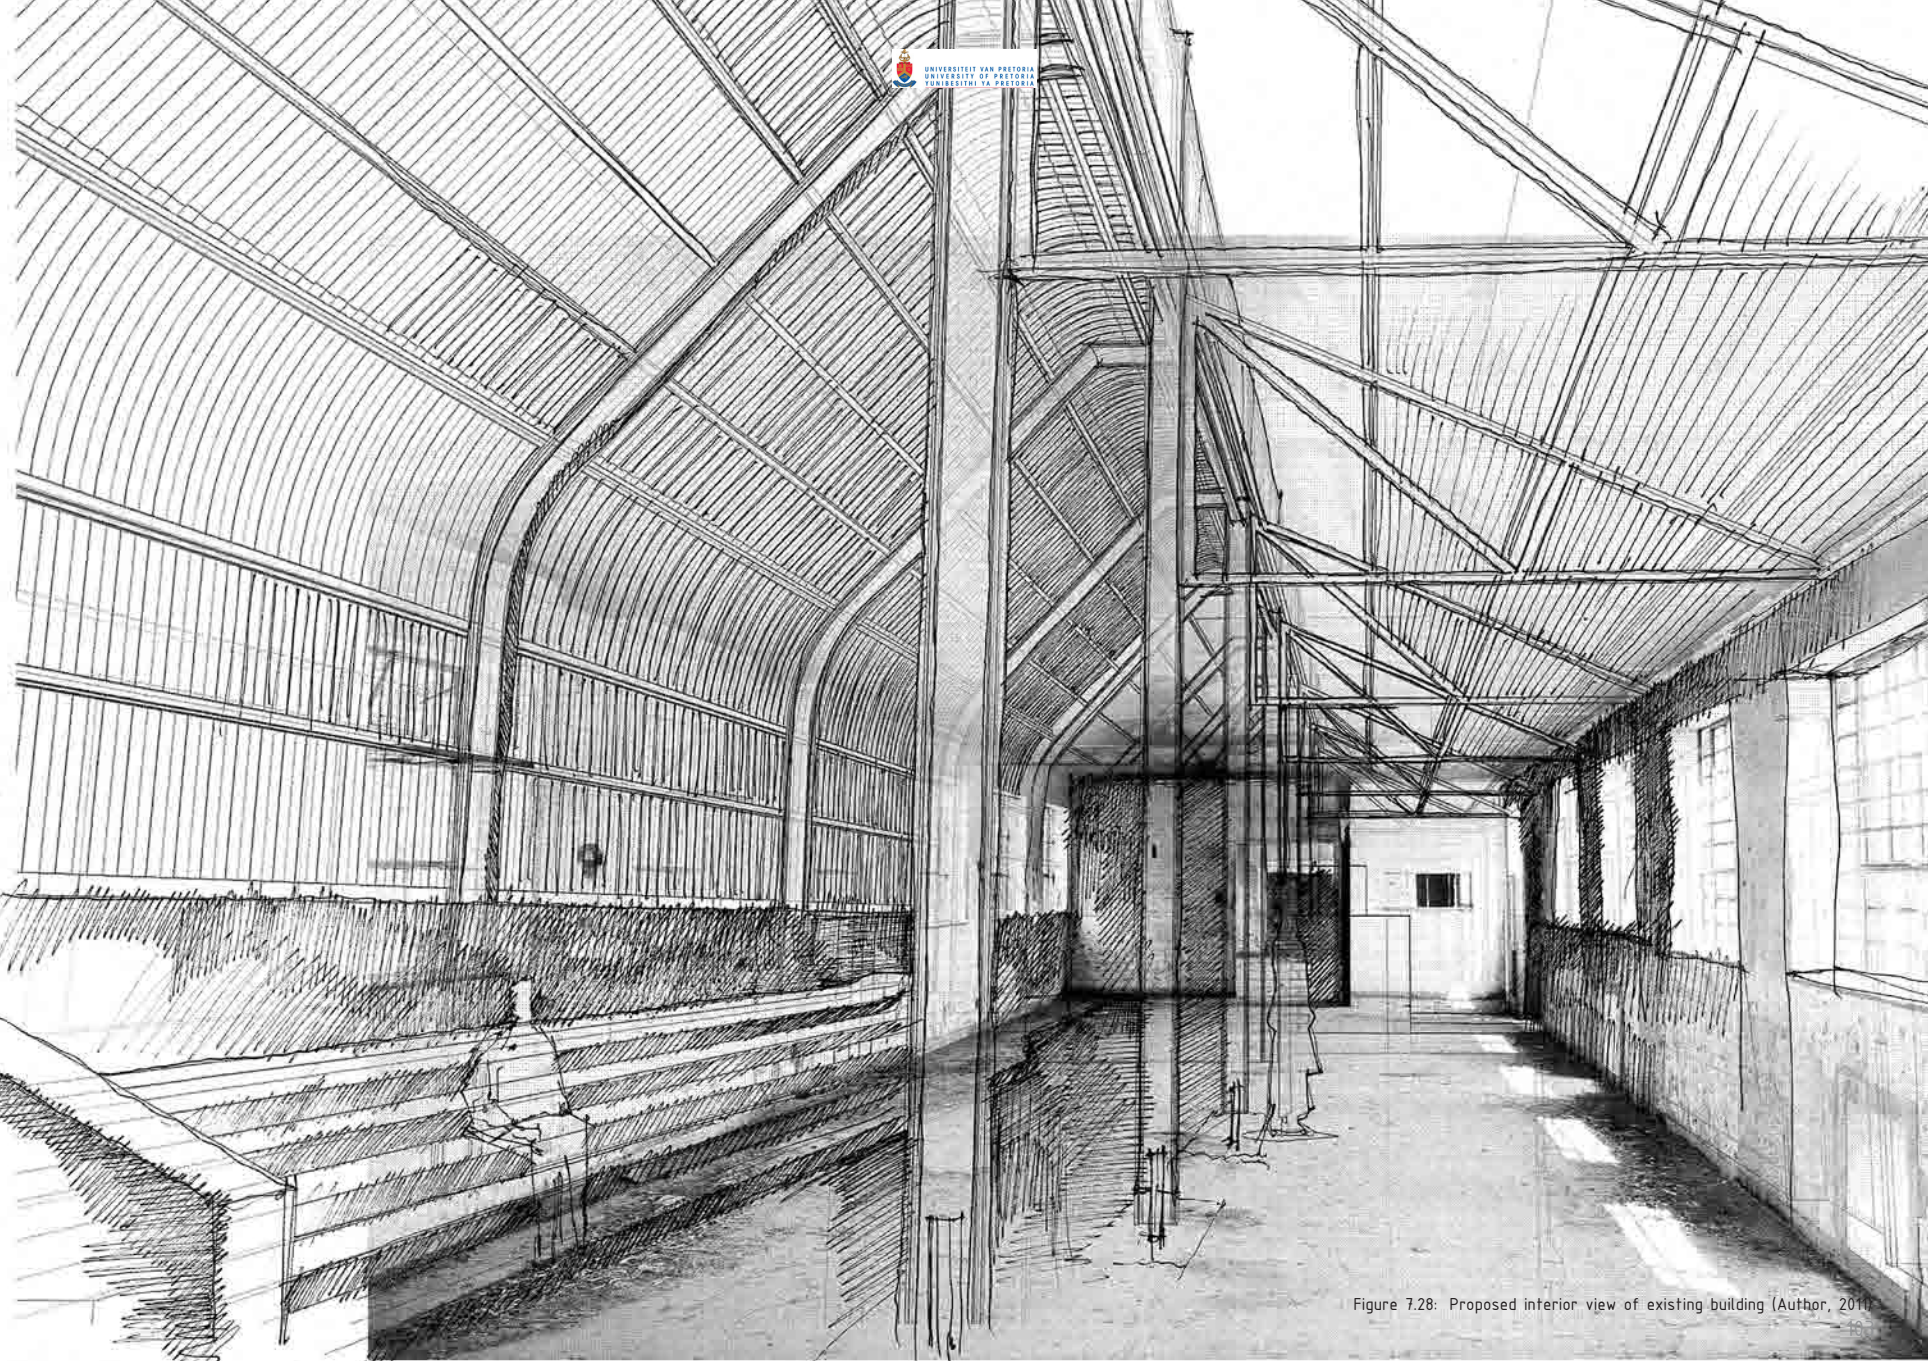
Proposed interior view of existing building (Author, 2011)
